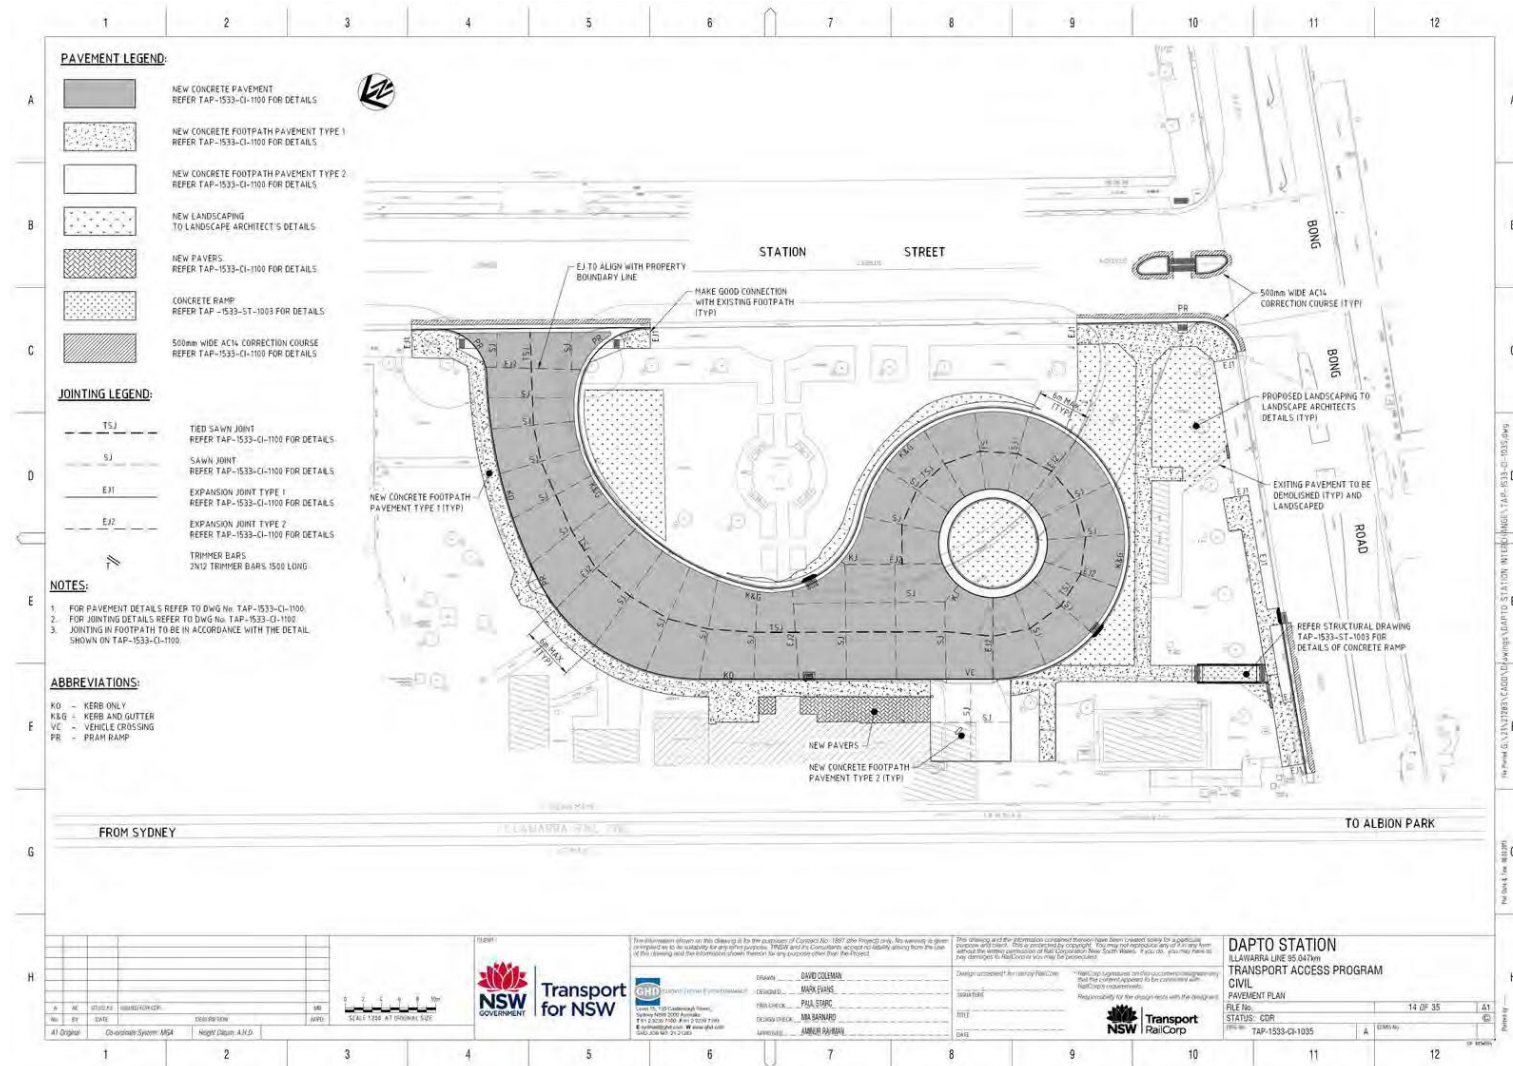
Dapto Station Transport Access Program: Pavement Plan (Source: TfNSW, TAP-1533-CI-1035).
